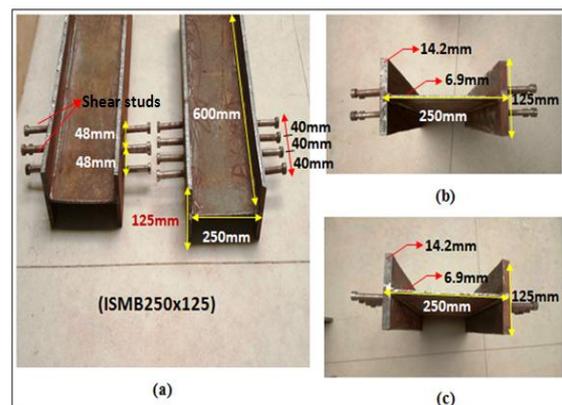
(A) STUD TYPE CONNECTION (B) SQUARE ARRANGEMENT (C) LINEAR ARRANGEMENT
